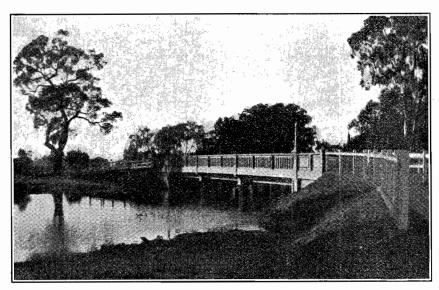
Bridge over Yarriambiac Creek, Warracknabeal.
